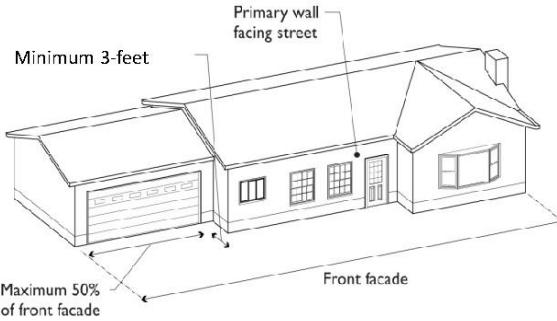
G(1): GARAGE FRONTAGE AND LOCATION
